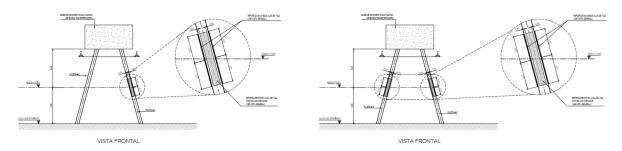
Example of the proposed pile reinforcement at Bent N.3.
